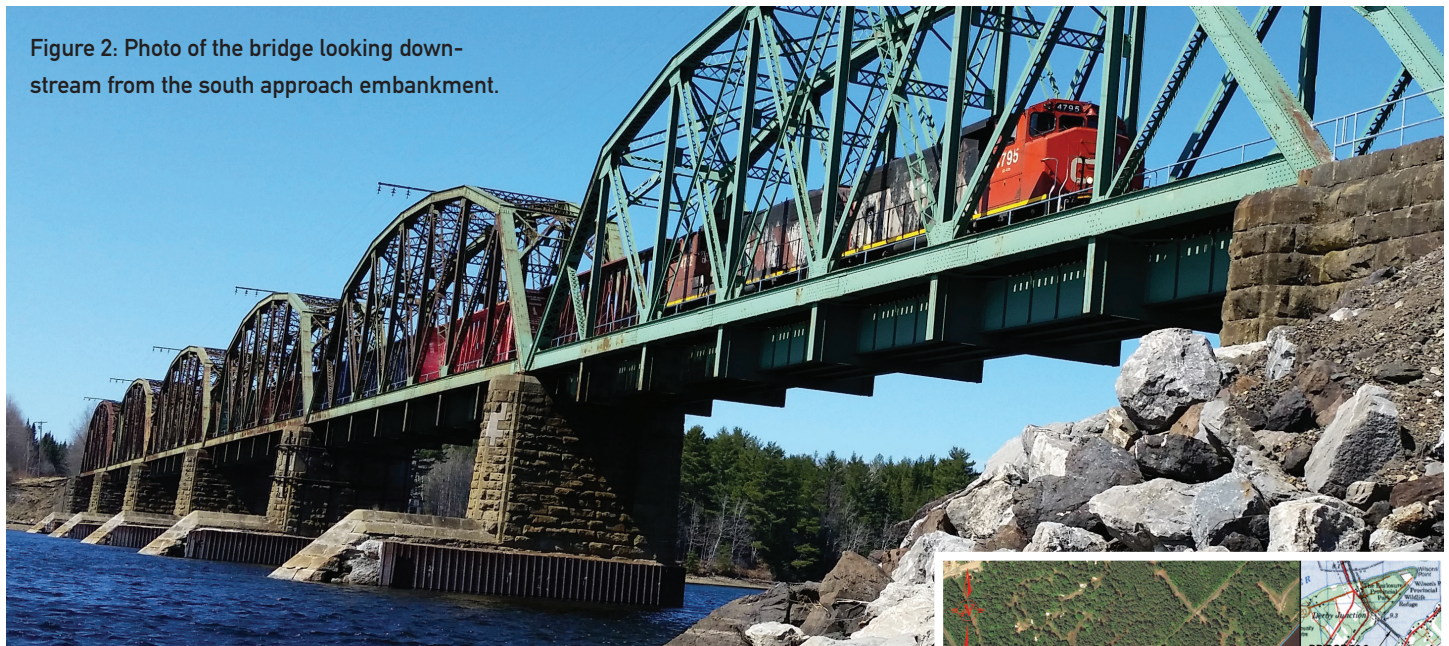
Photo of the bridge looking down-stream from the south approach embankment.
